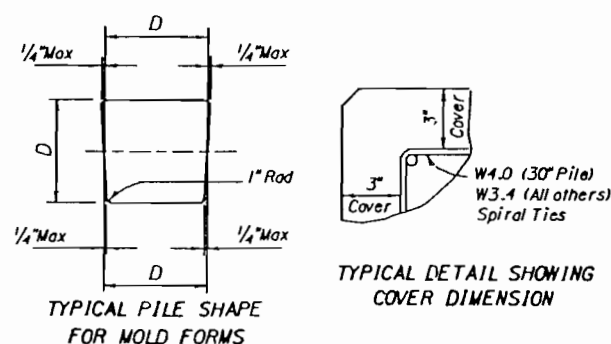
### DETAILS FOR REINFORCED PRECAST & PRESTRESSED PRECAST PILE SPLICES
